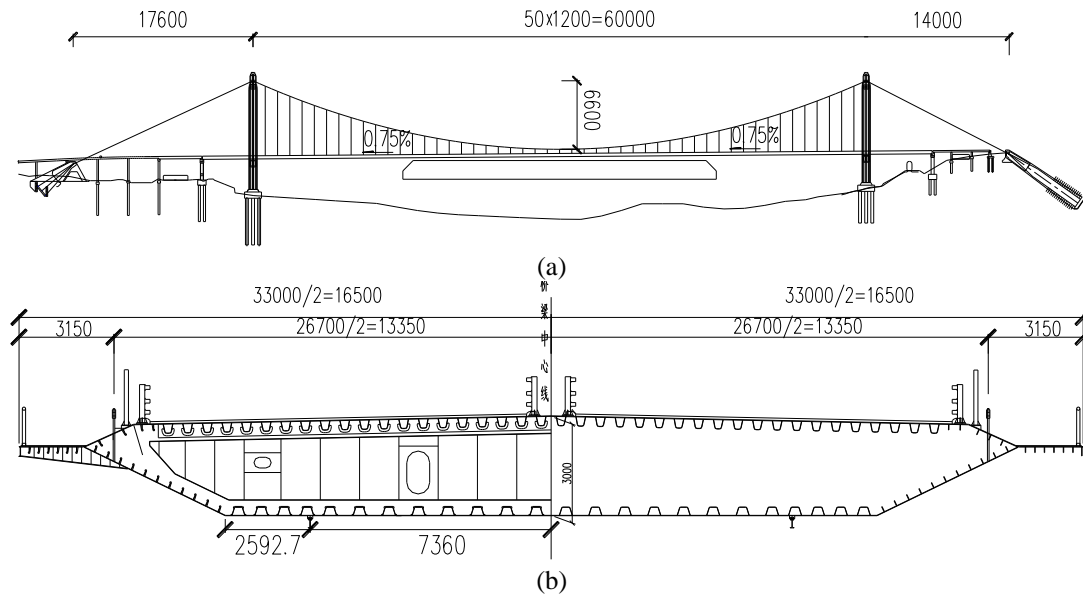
The sketch of Zhongdu Bridge: (a) elevation view (unit: cm); (b) cross section (unit: mm)
